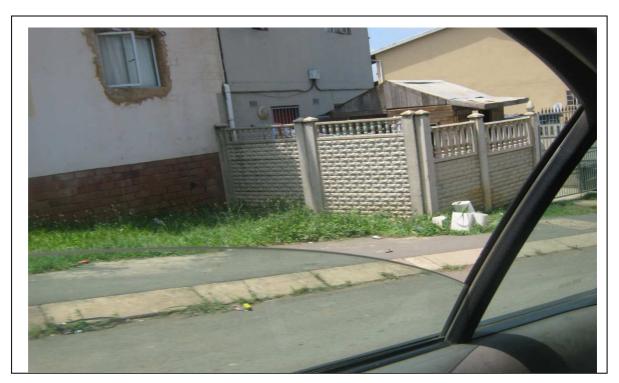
Example of House situated closer to the proposed servitude at Simunye Drive, Mount Moriah
